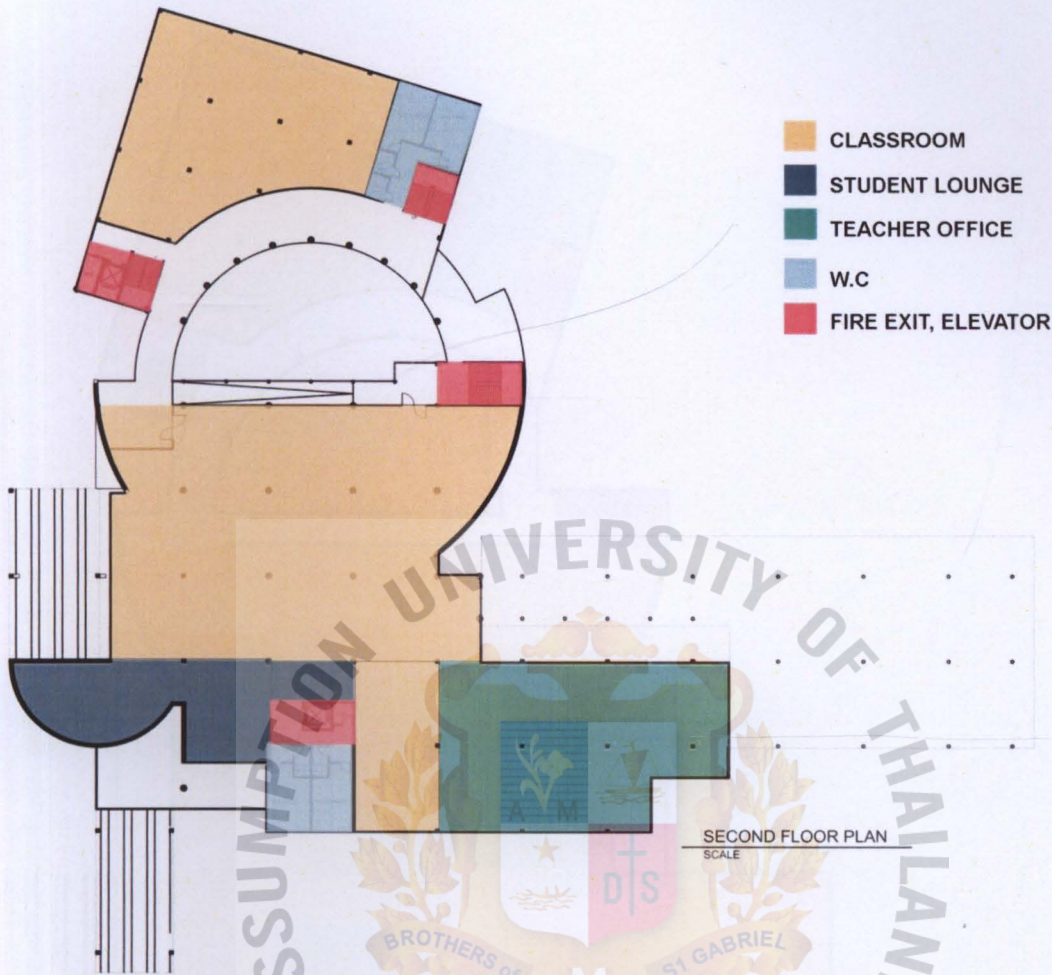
SECOND FLOOR ZONING PLAN
